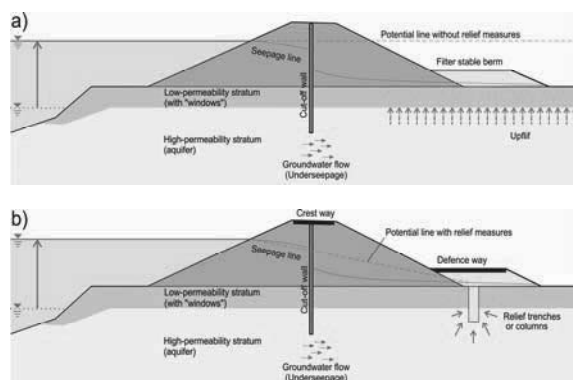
Permanent measures against hydraulic failure caused by underseepage of flood protection dykes: a) Filter stable berm as a counterweight; b) Relief drainage columns or trenches.
